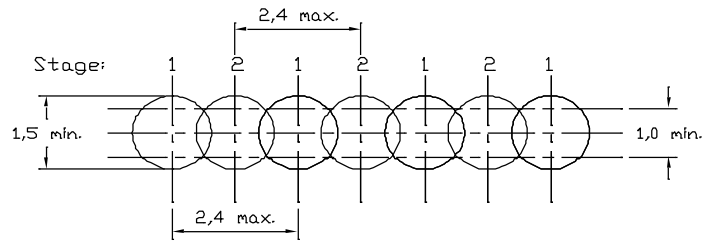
Sogamoso dam: Construction sequence for the excavation of vertical shafts with raise-borer
